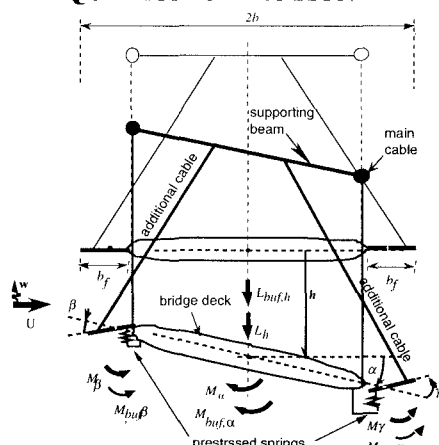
Cross-section of the bridge deck-flaps passive control system.
